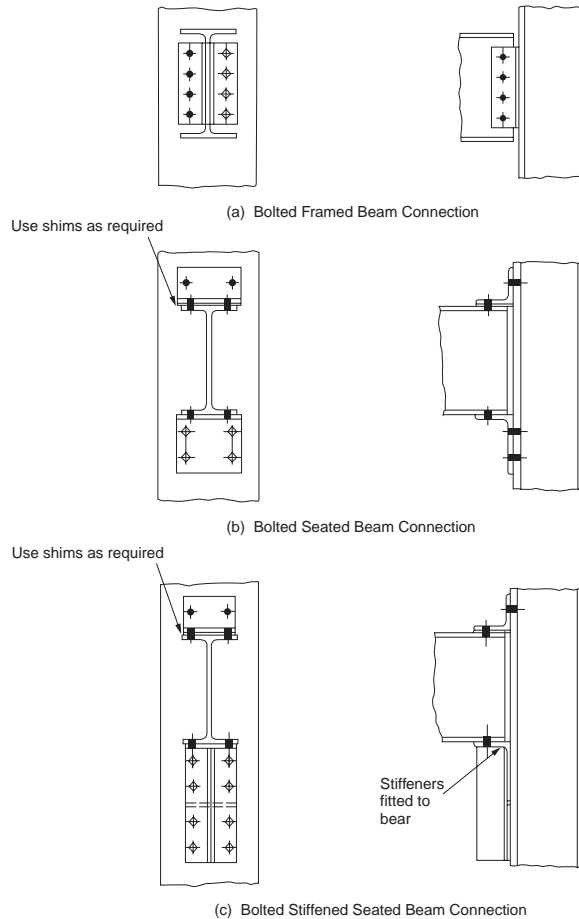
Bolted shear connections: (a) bolted framed beam connection, (b) bolted seated beam connection, (c) bolted stiffened seated beam connection.
